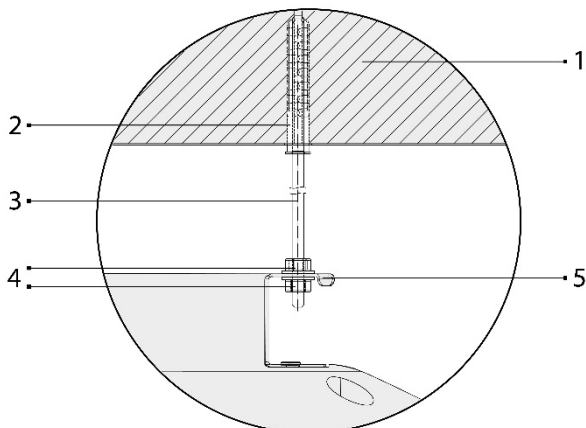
INSTALLATION IN A SUSPENDED CEILING
